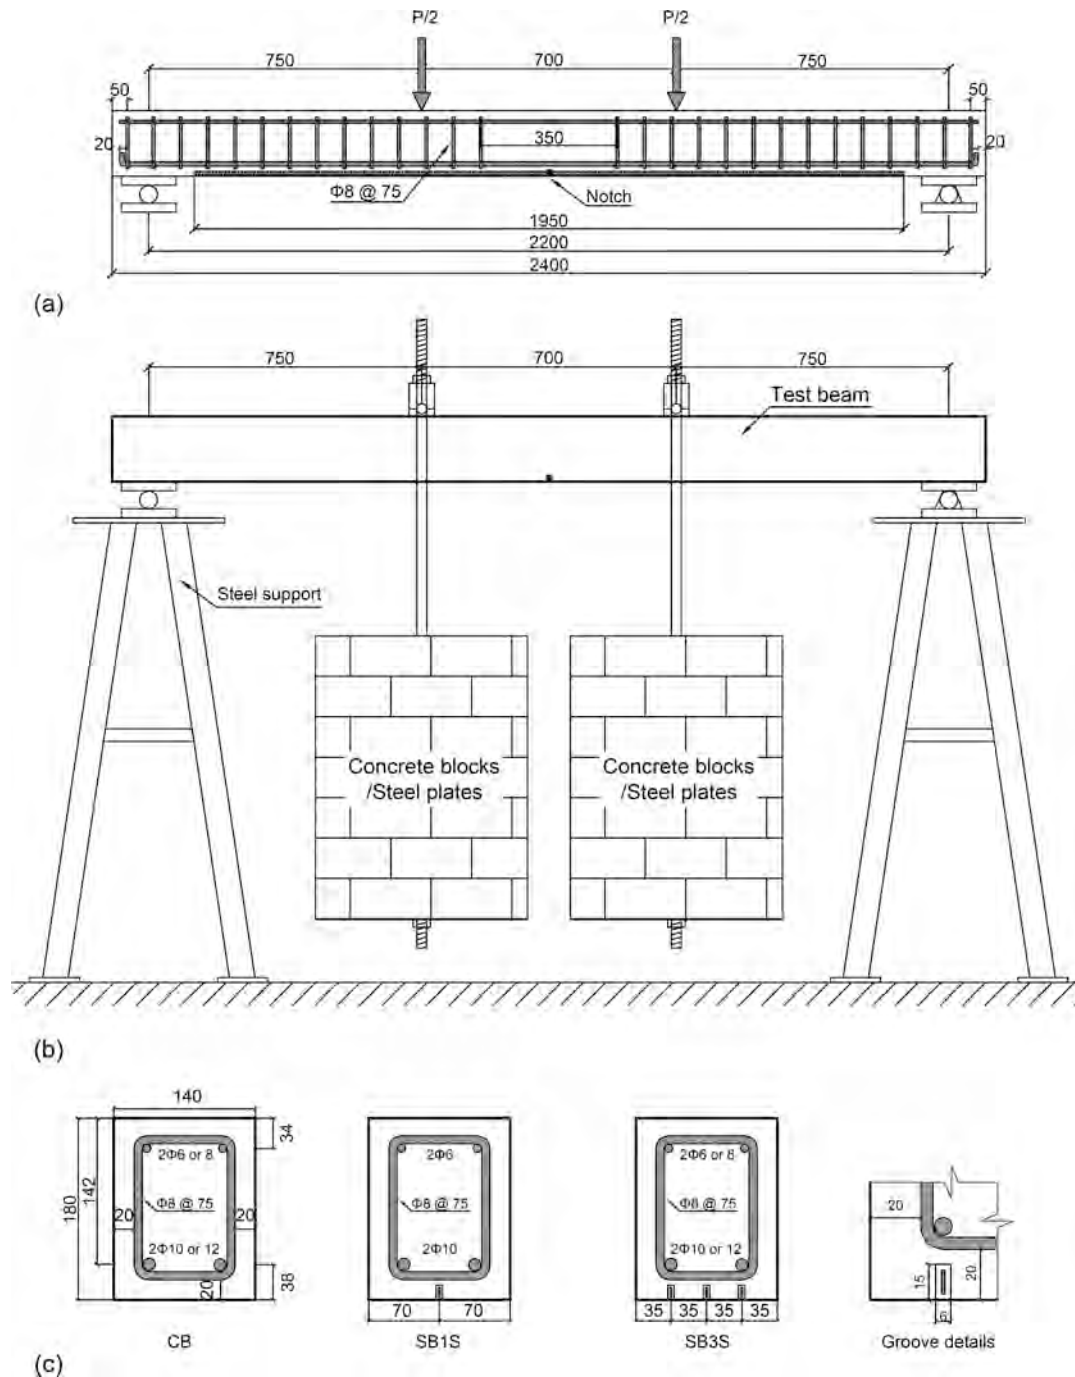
Details of the tested beams: (a) Short-term setup; (b) Long-term setup and (c) Beam sections (dimensions in mm).
